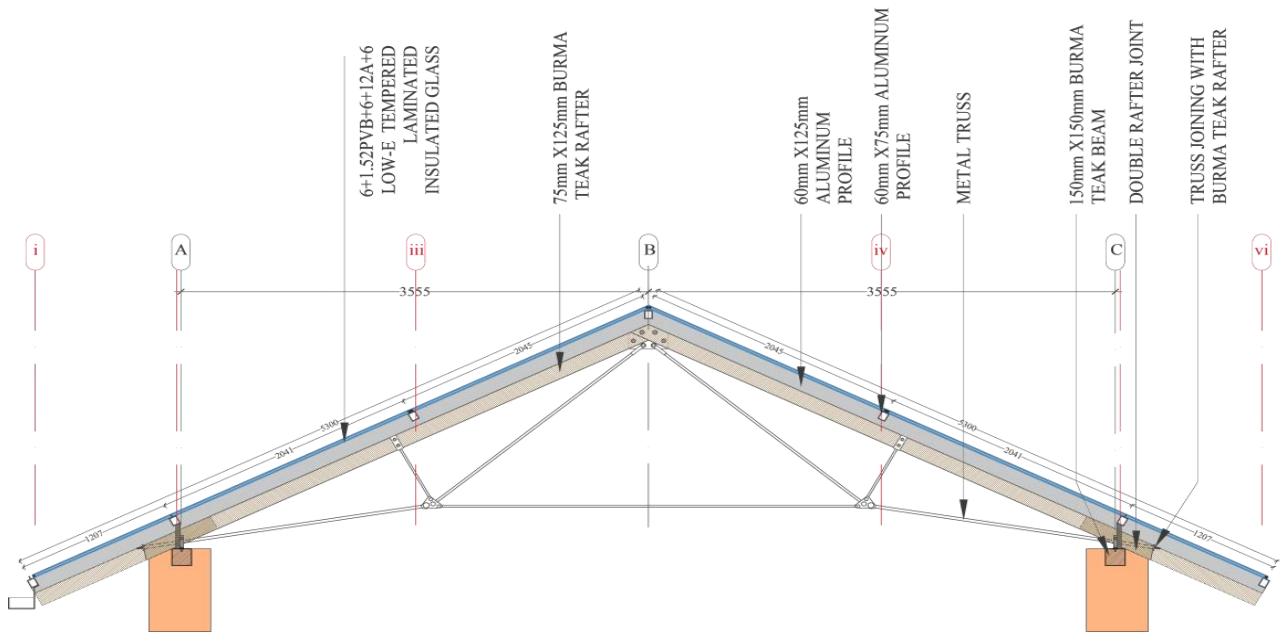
Drawing of Aluminum Profile Joint Detail of CC-05
